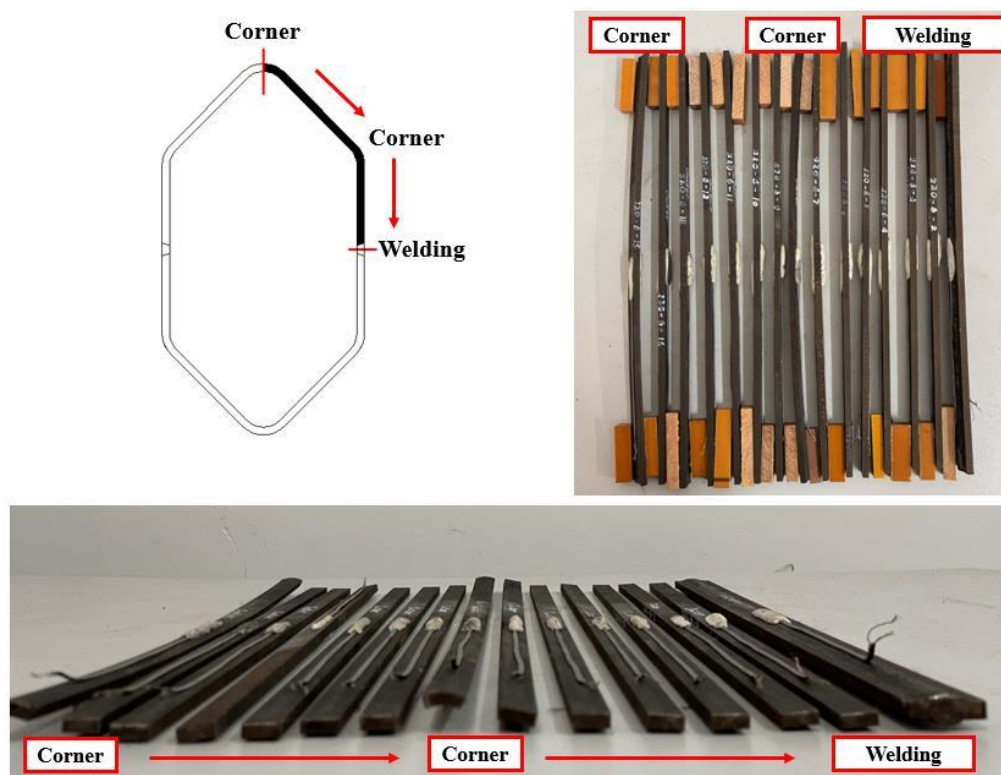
Deformed strips extracted from CF2-220 \times 6 – 2.00 after sectioning process.
